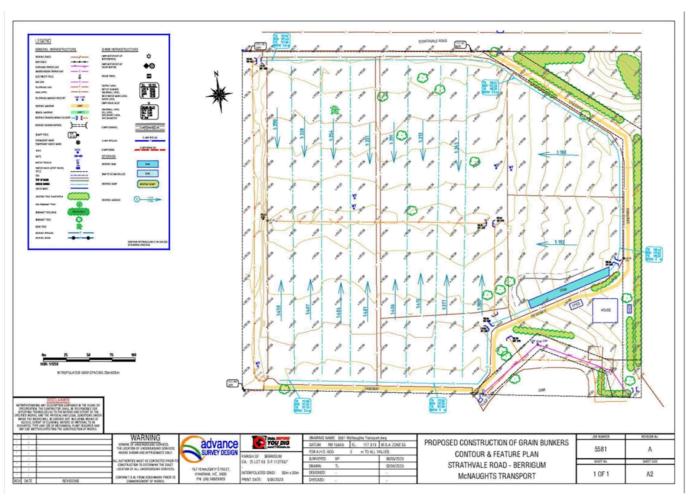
Construction Plan for grain bunkers, 92 Strathvale Road Berrigan (Advance Survey Design, dated 5/6/23).
